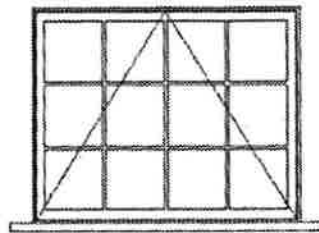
Proposed master bathroom window type on the west elevation of the new addition.
